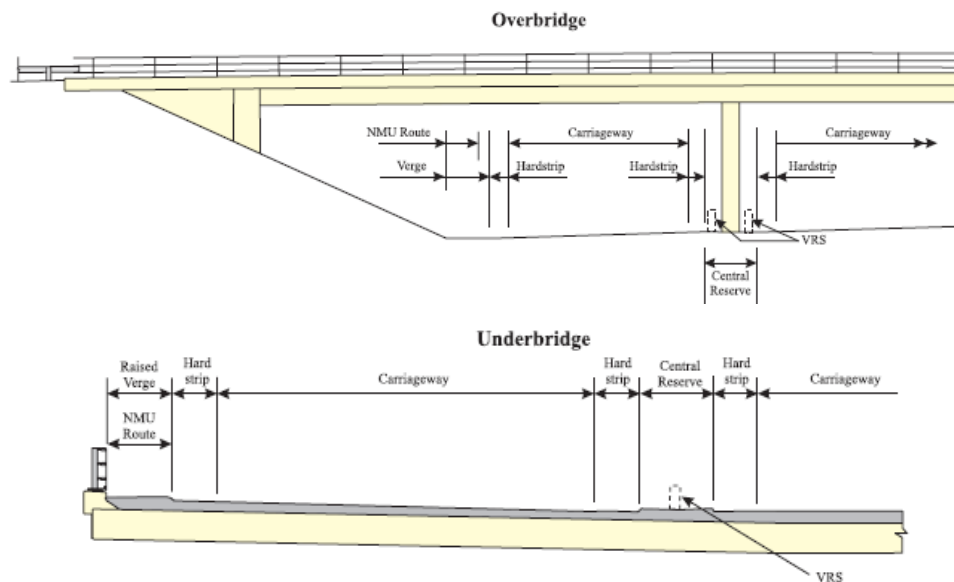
Rural All-purpose Dual Carriageway: Typical Overbridge and Underbridge
